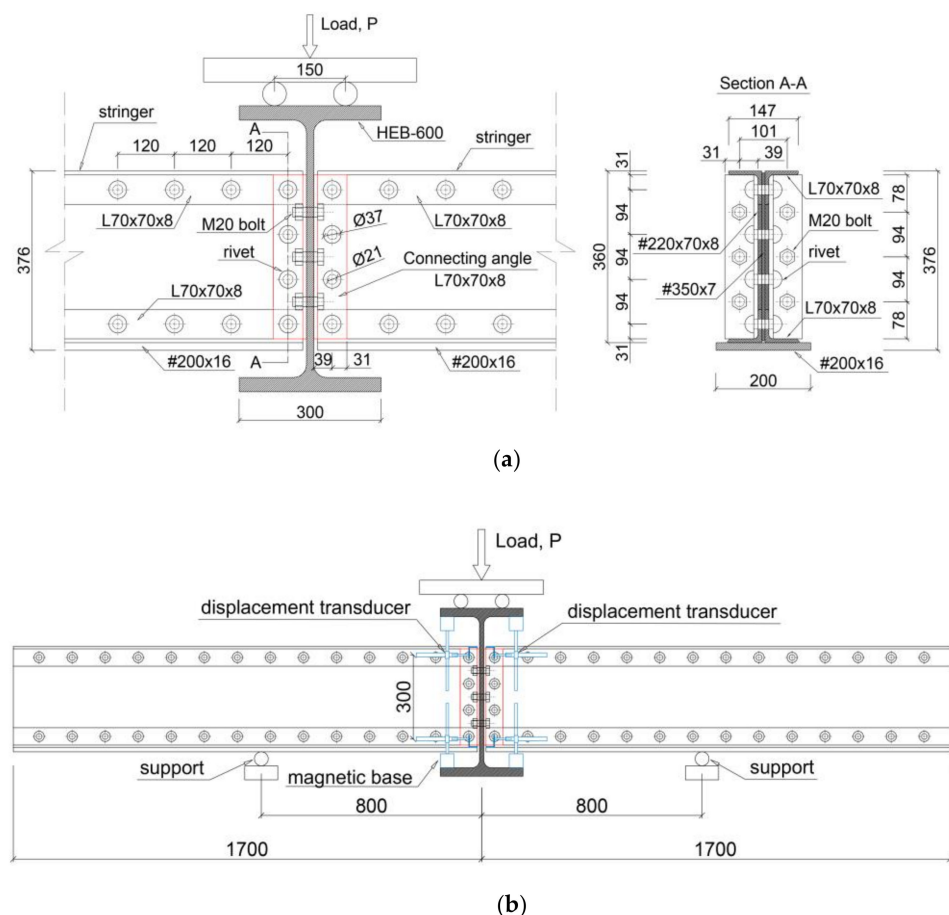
Sketches of the tested connections with original stringers from Redondela bridge (all dimensions in mm). (a) Details of the connection. (b) Test set-up.
